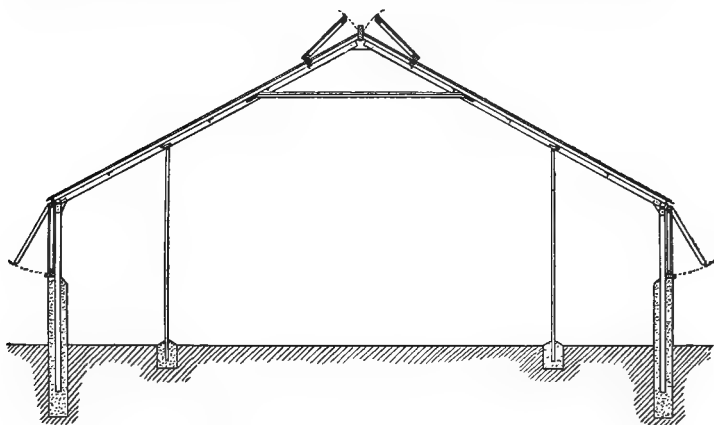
Semi-iron construction, showing posts and purlin supports set in concrete.
